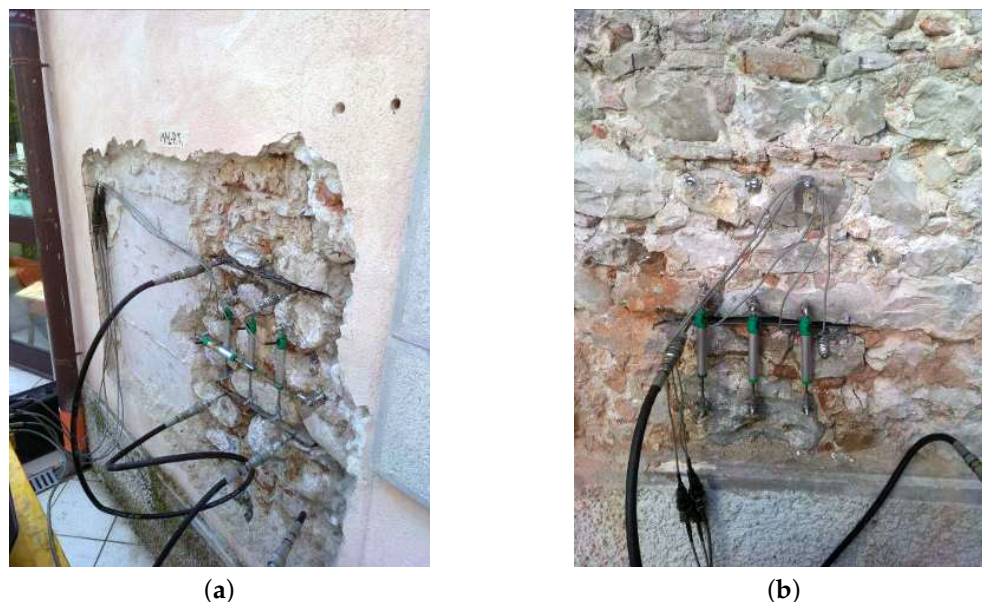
Flat jack tests. Location numbers according to Table 2. (a) Double flat jack test at location # 1. (b) Single flat jack test at location # 2.
